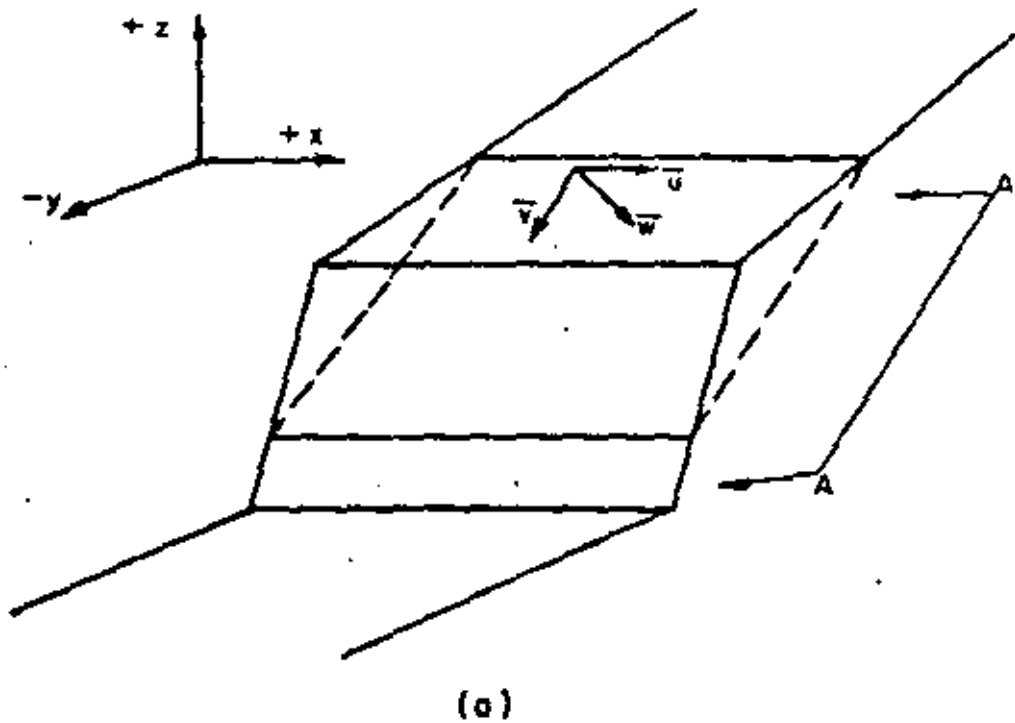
SLIDING ON ONE PLANE — STRIKE OF PLANE PARALLEL TO STRIKE OF SLOPE FACE
